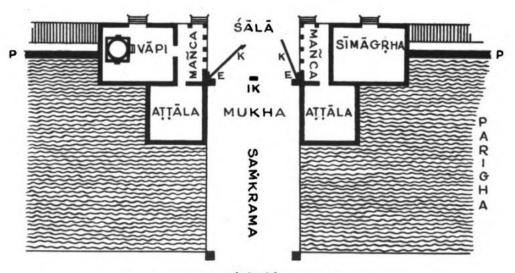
GROUND FLOOR (aditala) WITH BRIDGE AND MOAT
